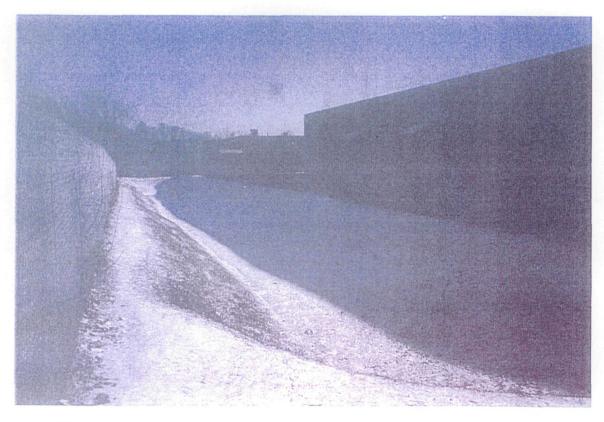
Sodded stormwater retention area located north of (behind) the 2852 Hitchcock building.
